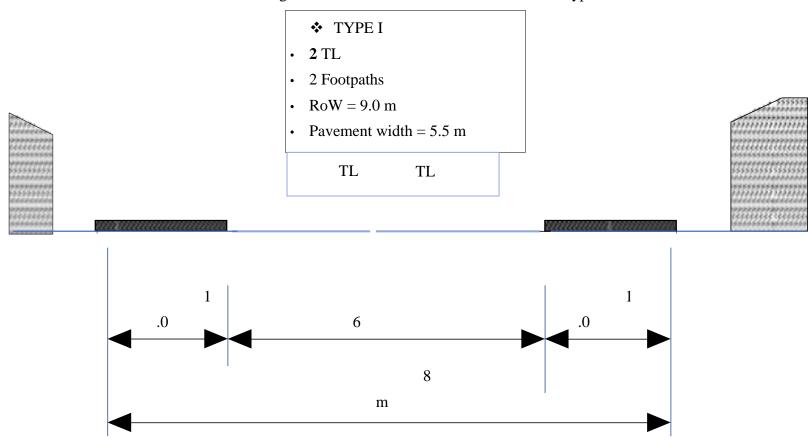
Typical Cross-section for Class C Roads (with RoW 8m)
